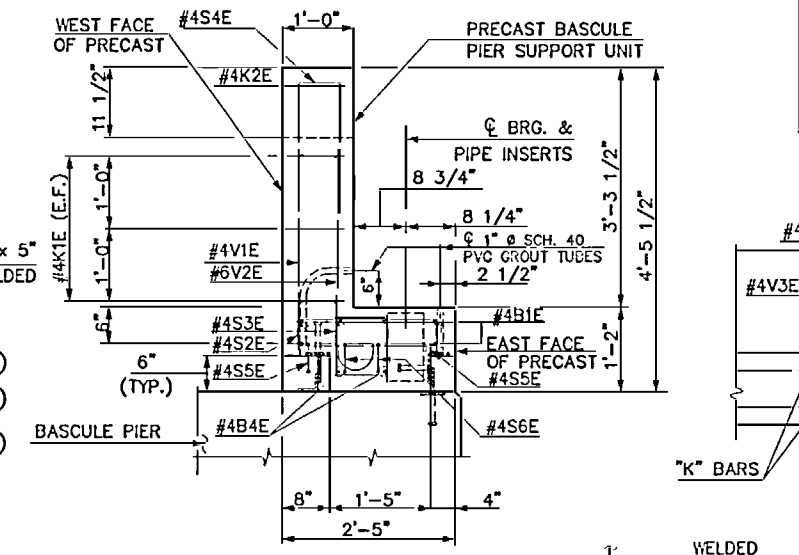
DETAILS OF ANCHORAGES @ WEST FACE OF BASCULE PIER SUPPORT
